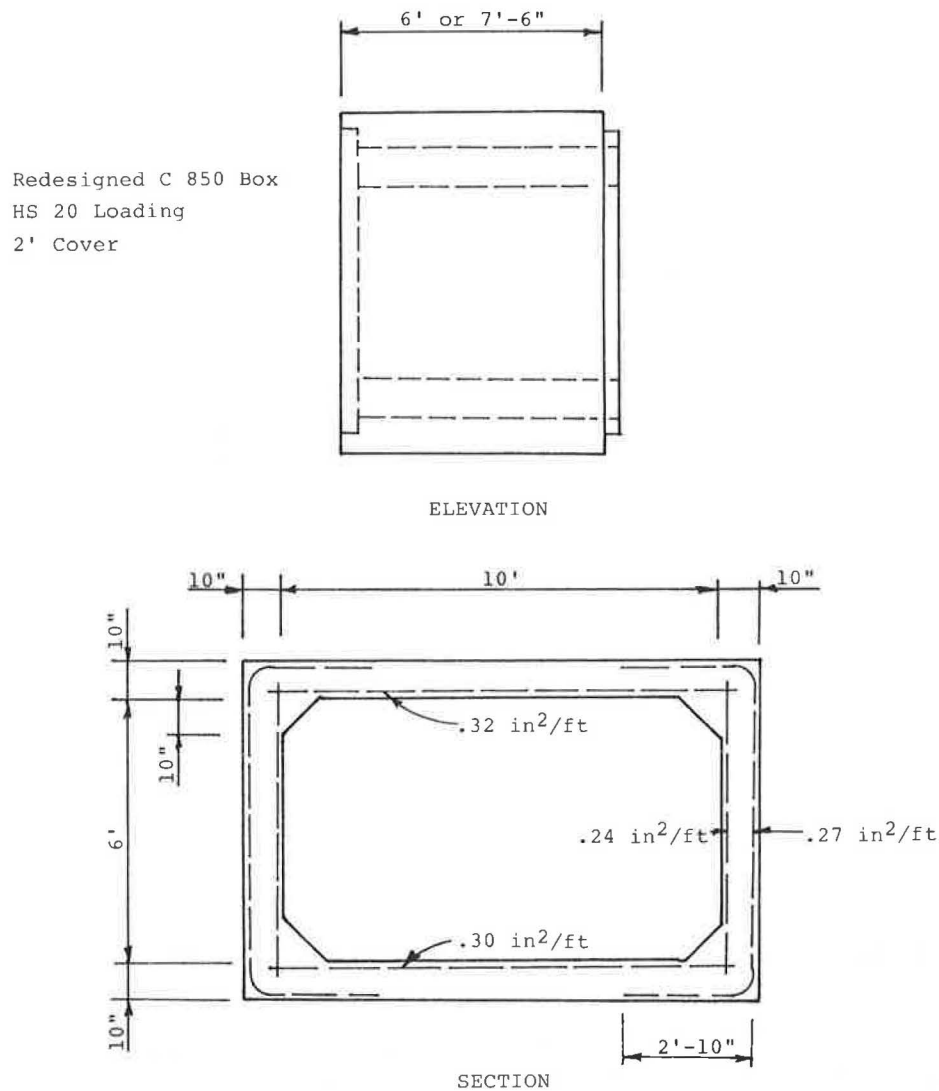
Details of redesigned 10-ft by 6-ft box culvert (Ohio DOT bridge CRA-19-17.10).
